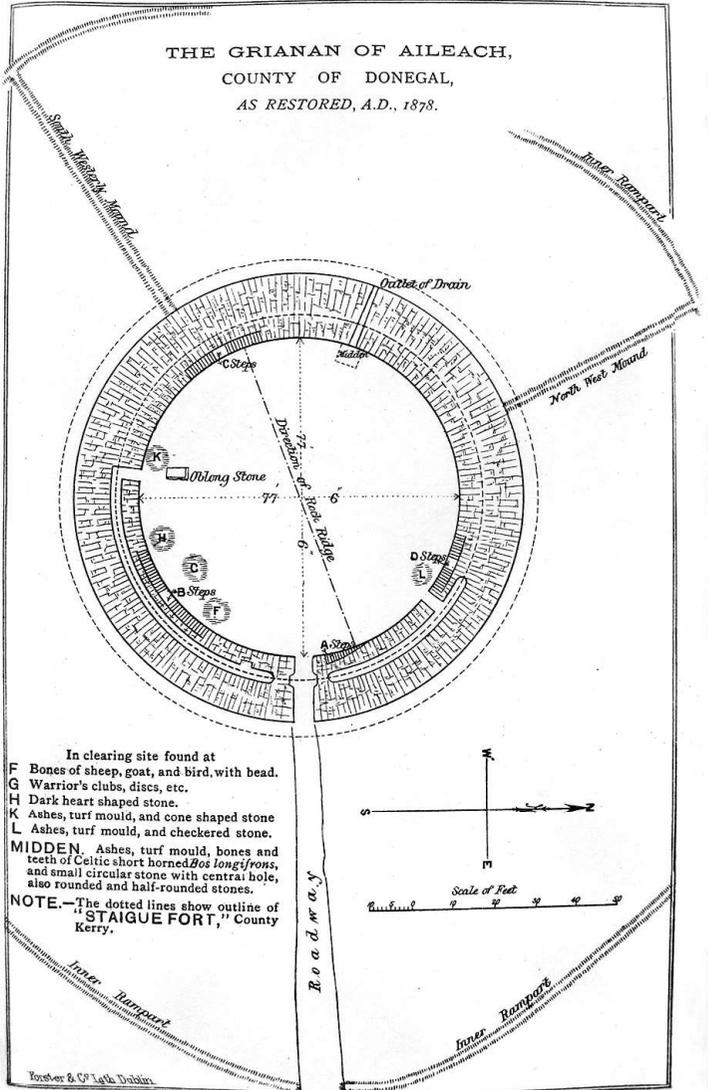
Walter Bernard's Plan of An Grianán 1878
